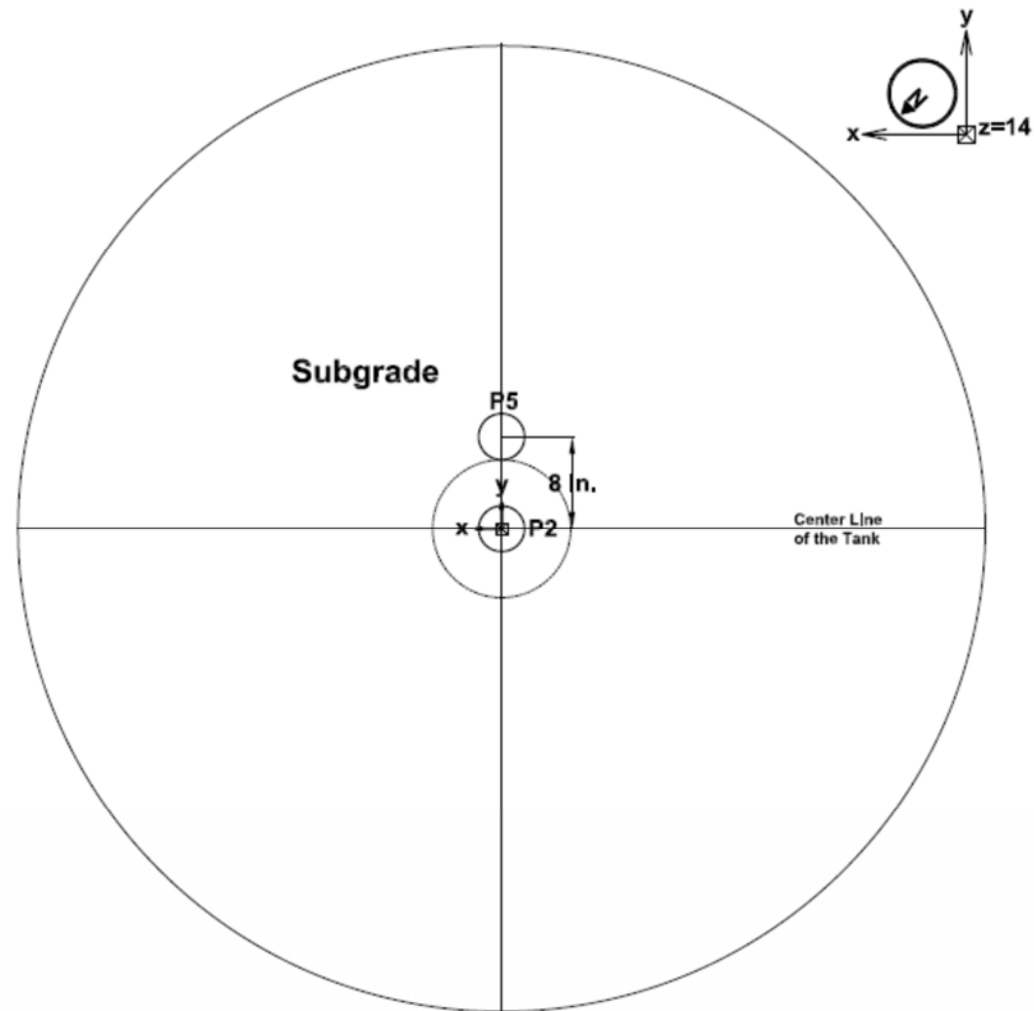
Instrumentation plan for experiment No. 1—Plan view, $Z = 14$ inches
